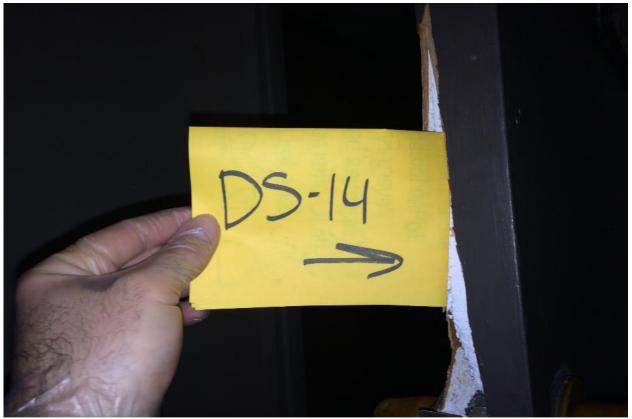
Laboratory analyses detected 60% chrysotile asbestos and 30% amosite asbestos within central room fire door sample DS-14 collected from the Dormitory Building central room door.
